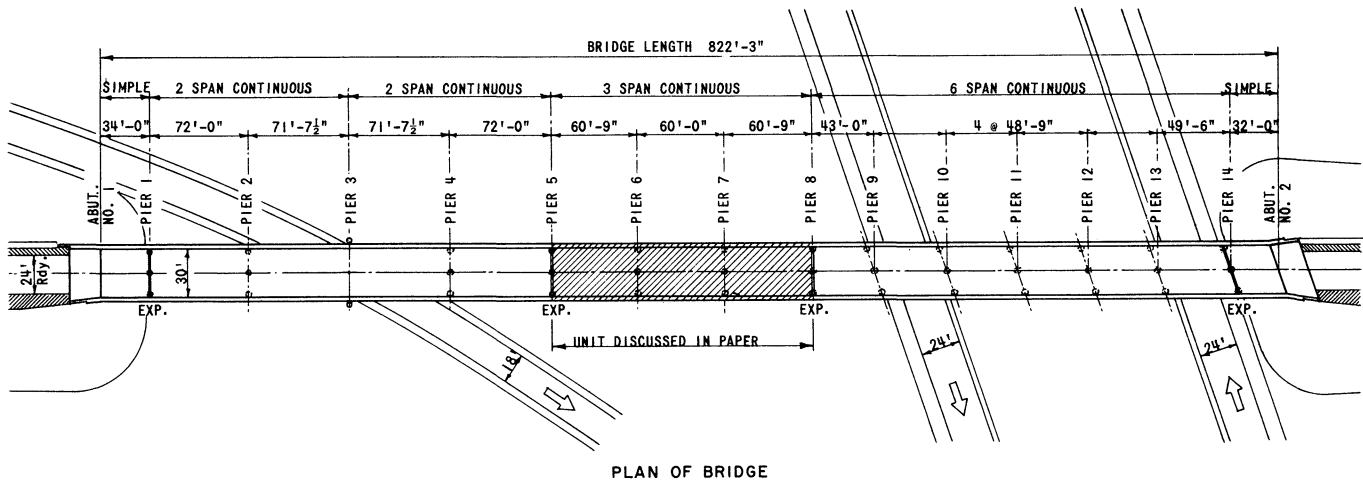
Plan of bridge discussed in Part 1. Revision of roadway width caused this bridge to be redesigned using 8 ft-6 in. stringer spacing.
